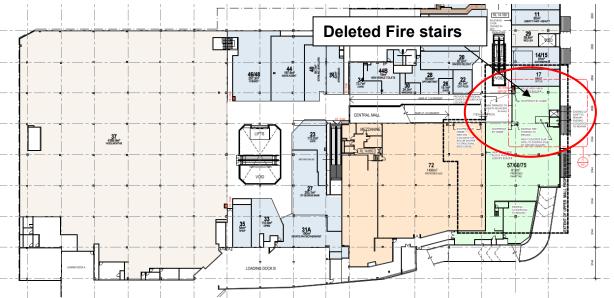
Proposed upper mall level layout removing fire stairs at 122-138 Flood Street.
